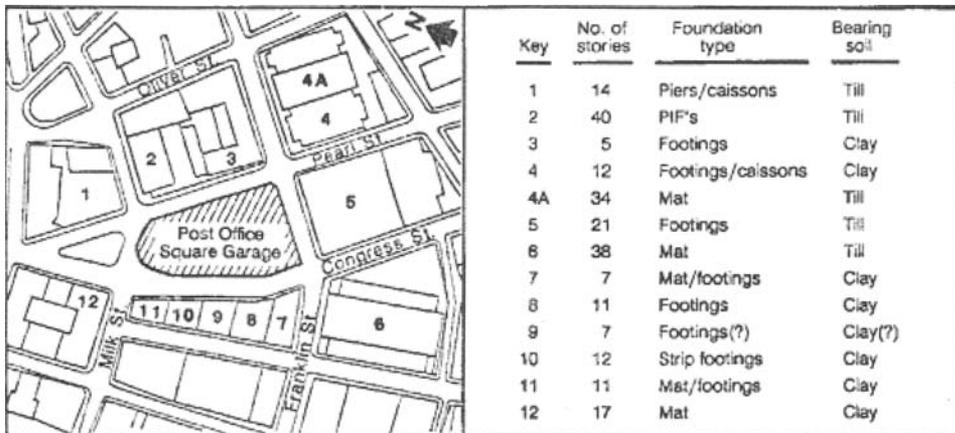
Post Office Square Garage site location and adjacent buildings (after Whitman *et al.* 1991).
